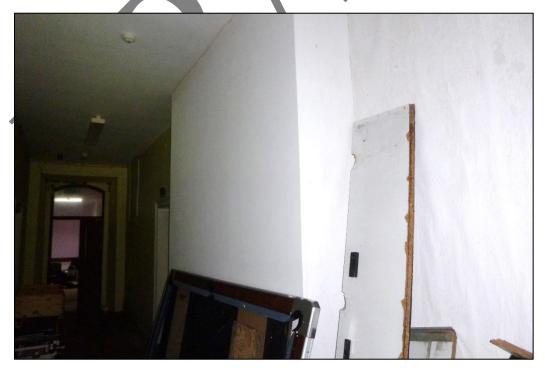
Blocked access to stairwell from main ground floor corridor (18.02.2025).
